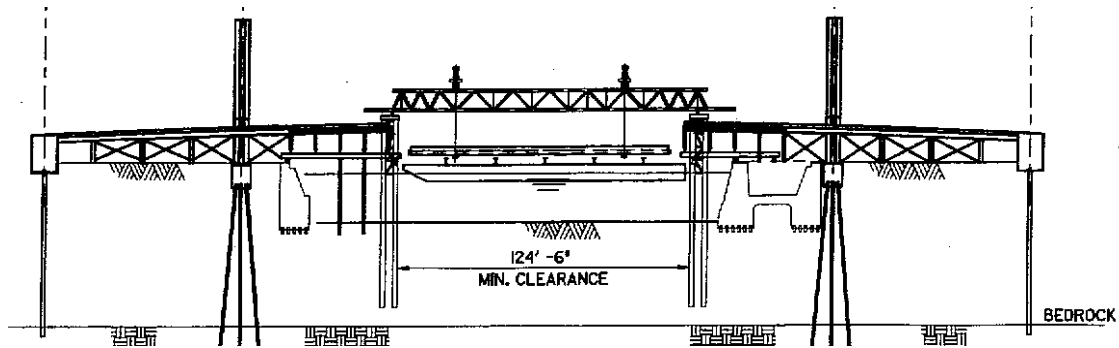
Cross-sectional view of the completed center span lifting assembly. *Courtesy of McHugh Construction / Bridge Concepts*³
